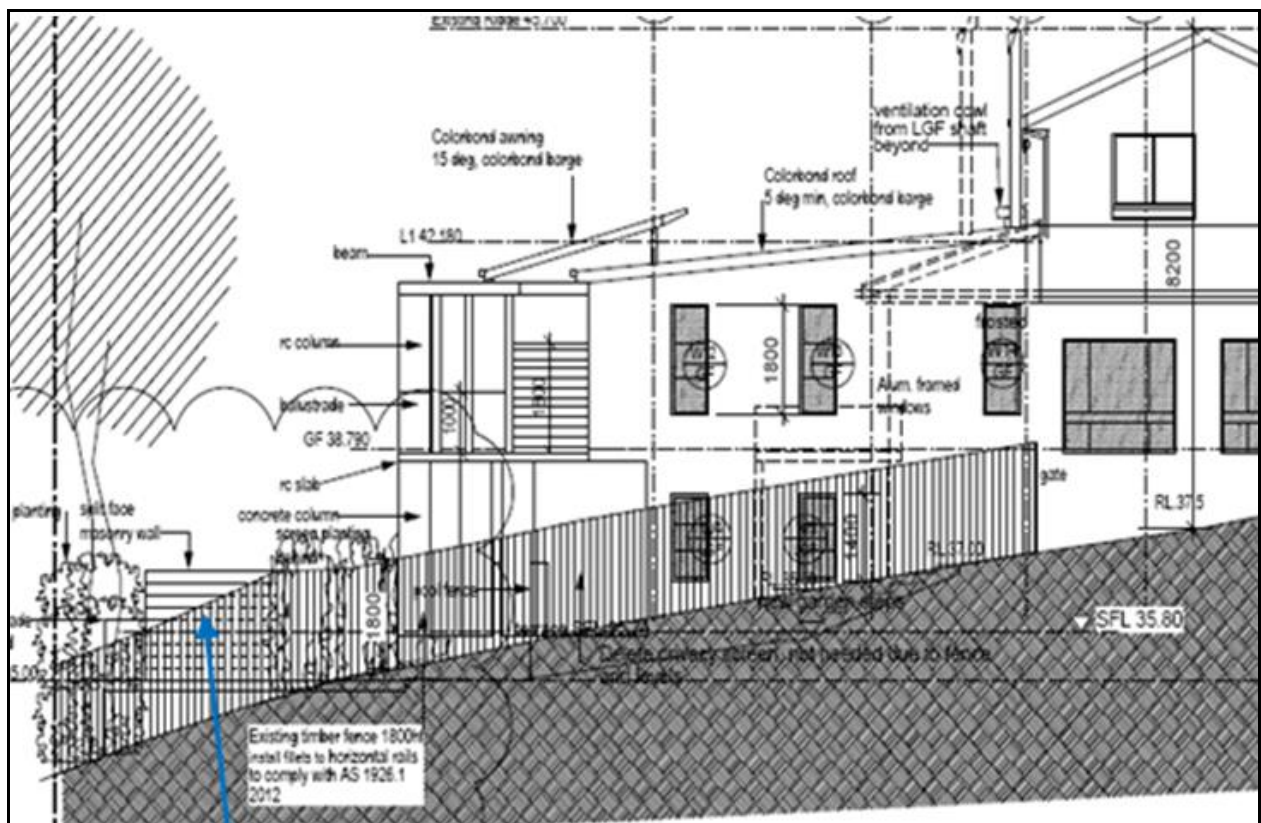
South - Eastern Elevation (showing 1.8m high masonry wall)
